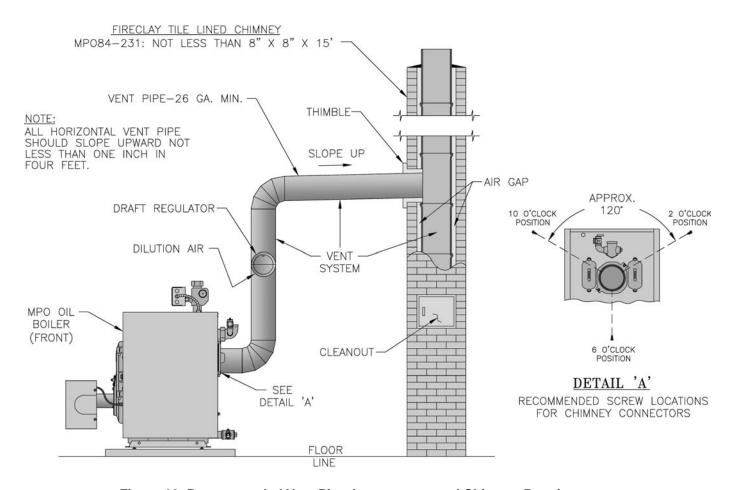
Recommended Vent Pipe Arrangement and Chimney Requirements
